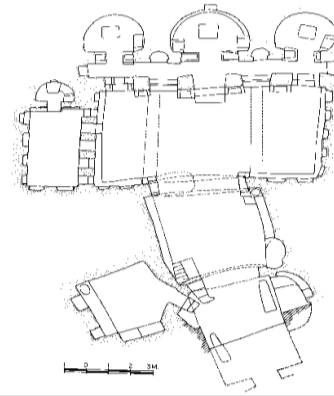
Buckle Church Plan Drawing (Epstein 1986)
